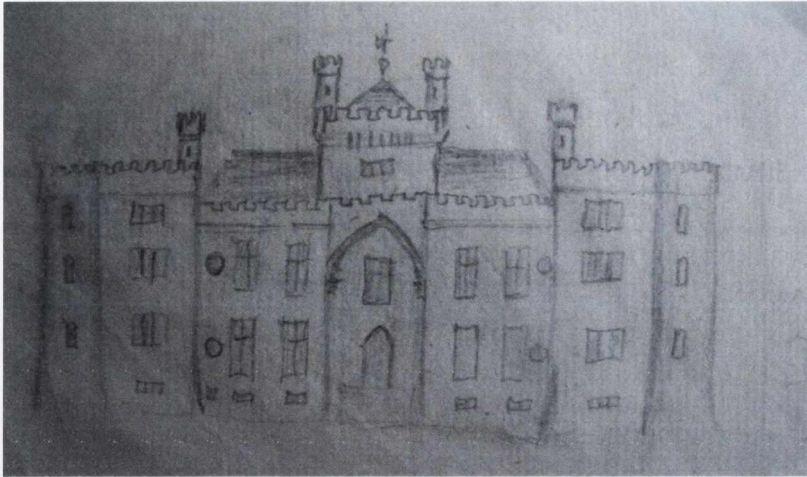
Birr Castle, sketch of proposed north elevation, Laurence Parsons, [1802–1803], Sketch notebook, f. 8r.
